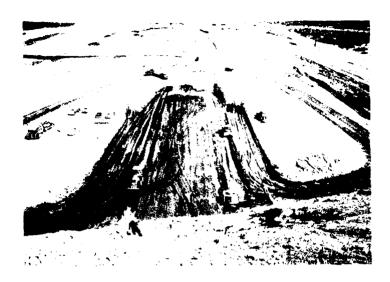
Stage I dam embankment fill placement. Note breach in Stage I diversion levee to allow equipment access. 28 February 1984
